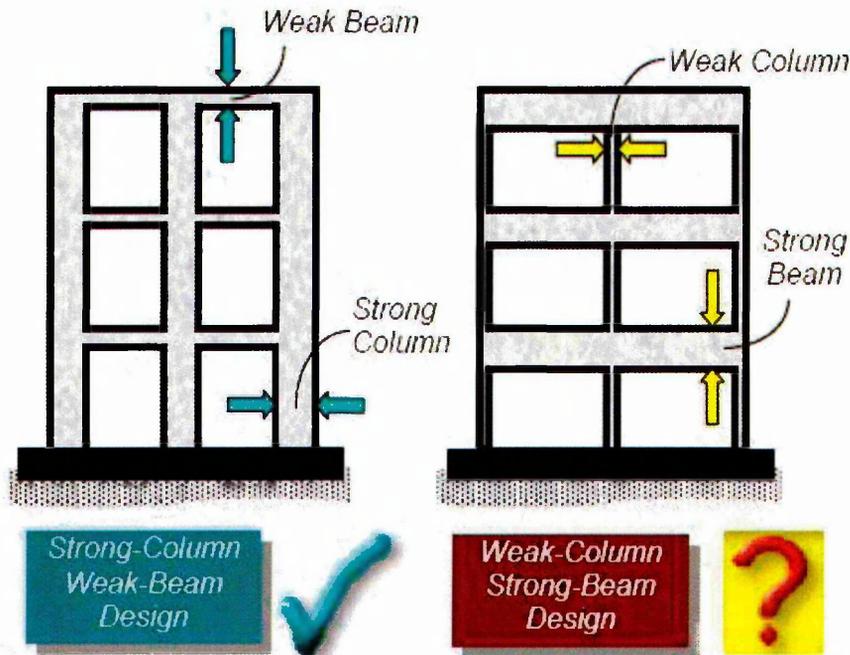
Reinforced Concrete Building Design: the beams must be the weakest links and not the columns (this can be achieved by appropriately sizing the members and providing correct amount of steel reinforcement in them) (IITK-BMTPC, 2002)
